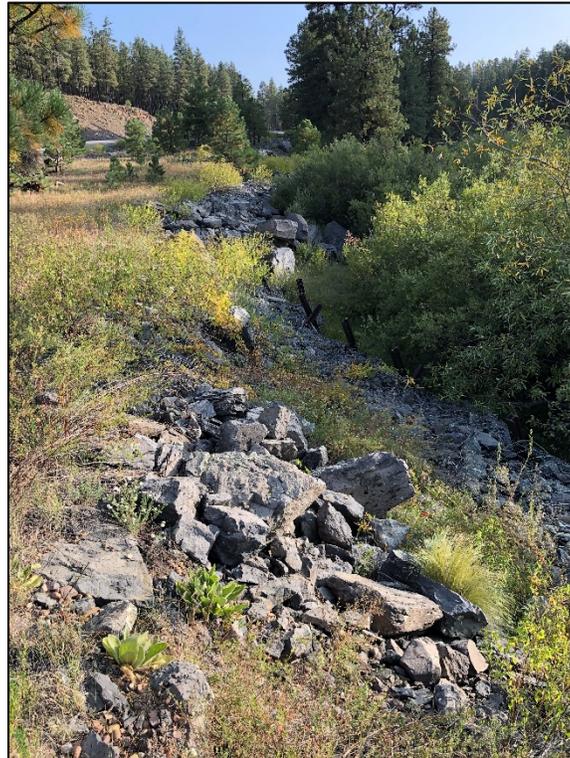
Rock Outcroppings, Embankment, & Rock Baskets Along Northeast Bank
